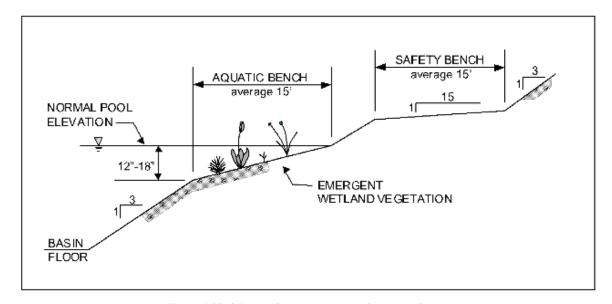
Typical Stormwater Pond Geometry Criteria
